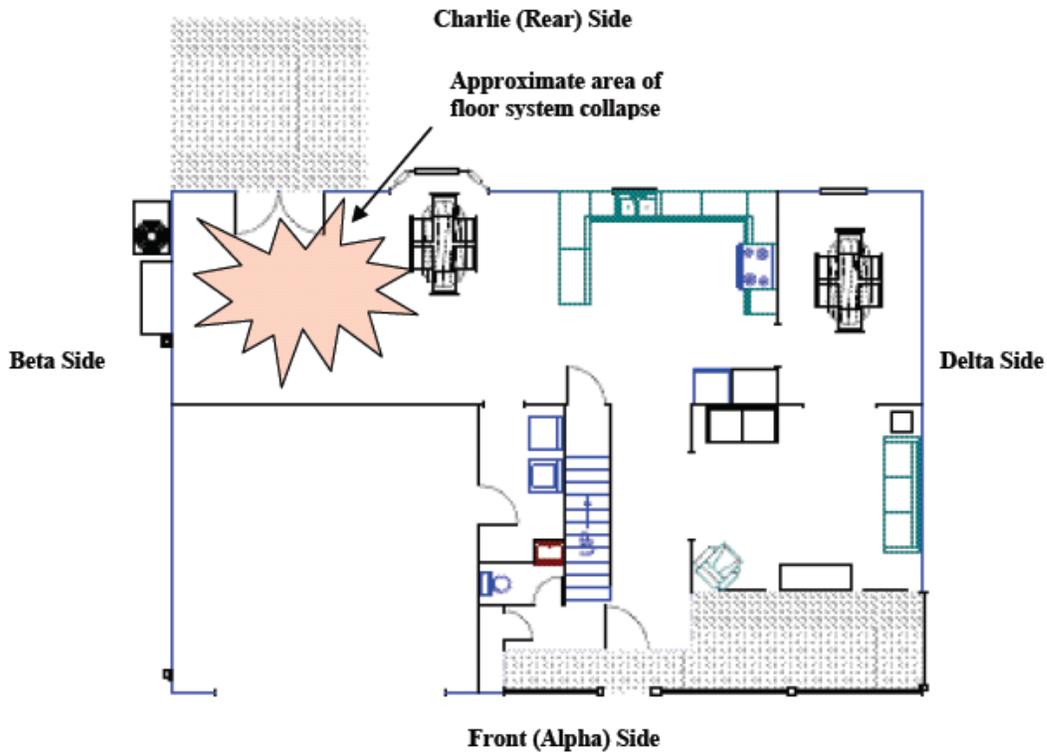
Structure's main floor layout indicating approximate area of flooring system collapse. (Ohio State Fire Marshal's Office)
